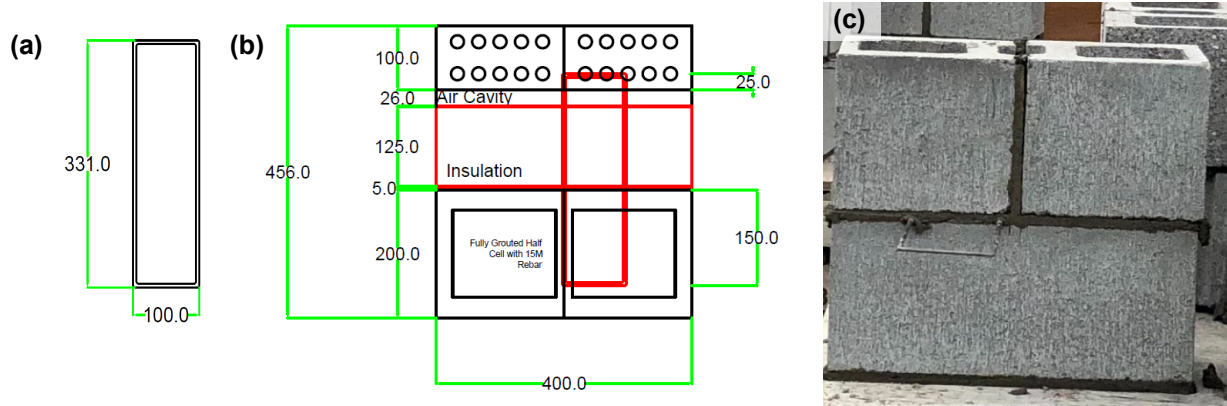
Rectangular tie connector illustrations (a) rectangular tie, (b) wall cross-section with rectangular tie, (c) wall specimen without brick veneer. All dimensions in mm.
